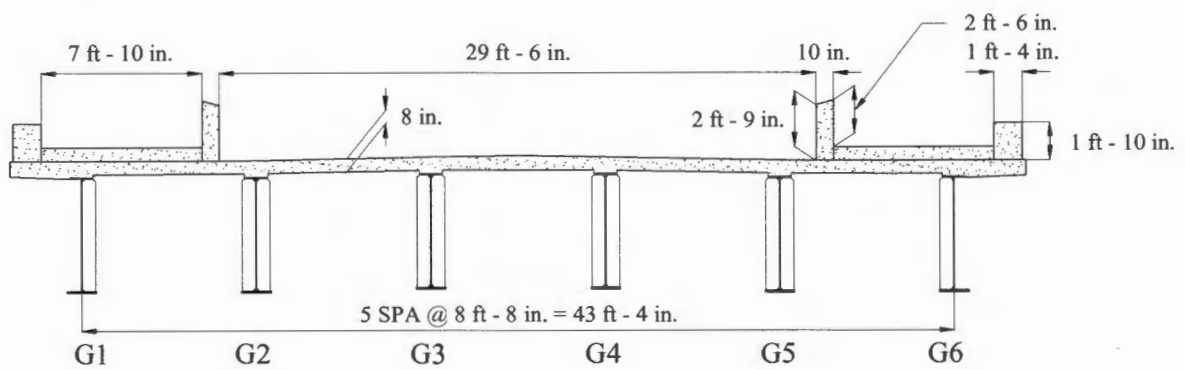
Typical cross sectional view of the E. 12th St. Bridge (looking North).
